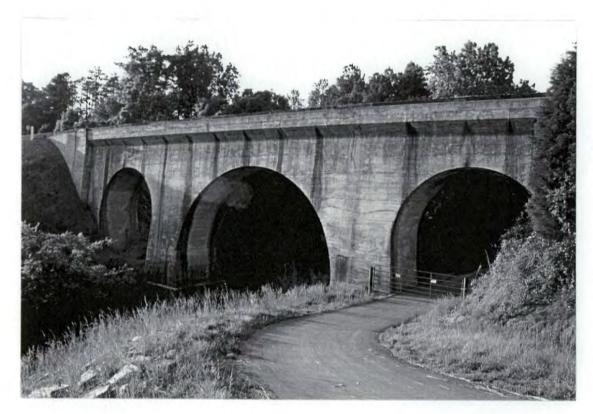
Railroad bridge across stream just north of US 70, Catawba, looking northwest (outside of APE)
